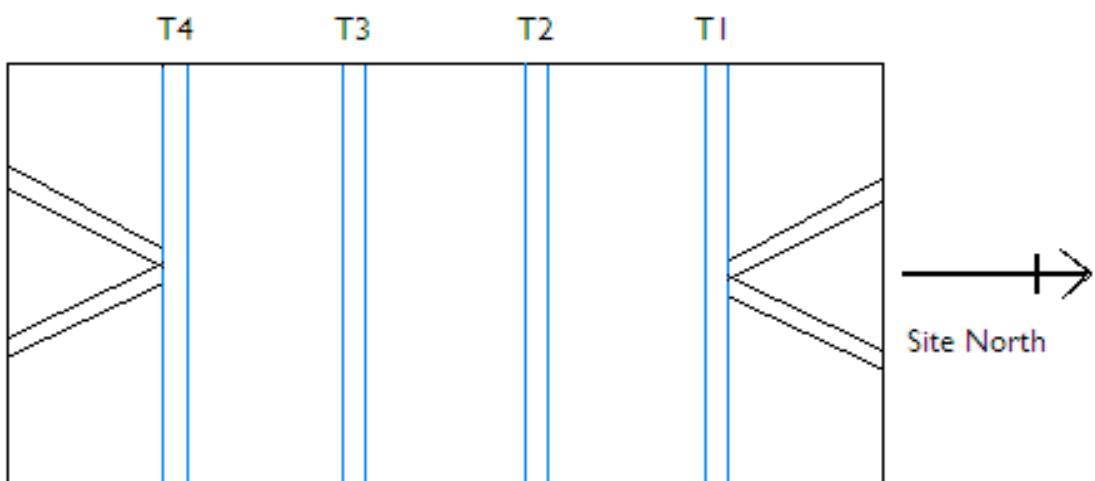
Stable; sketch plan of the roof, showing the approximate position of trusses
